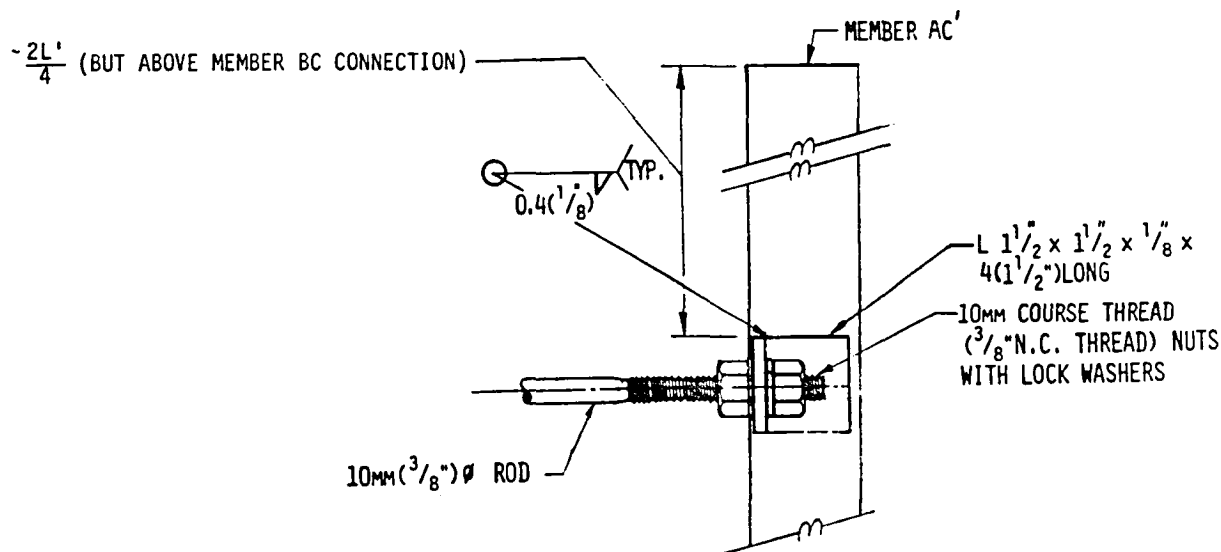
Horizontal Bracing Strut Connection Detail Type 1 for Two-Tier Two, Three, and Four Span Structures
